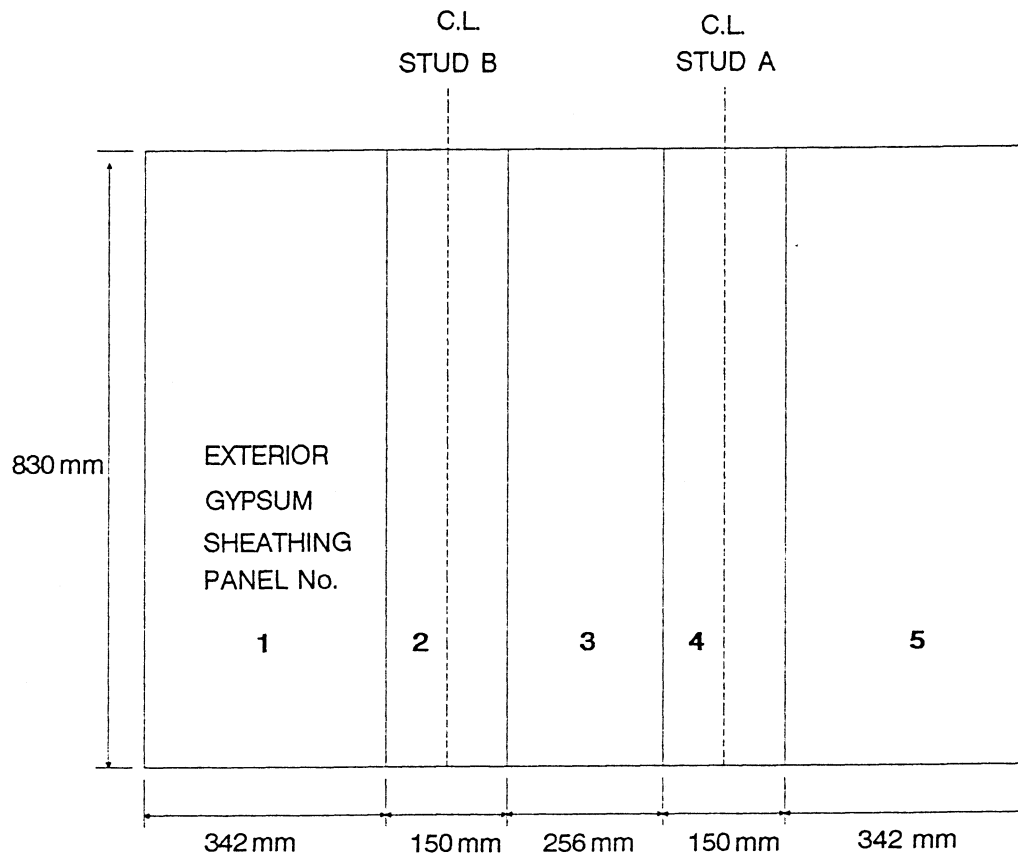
Exterior View of Gypsum Sheathing Panels in Wall Specimen 1B
